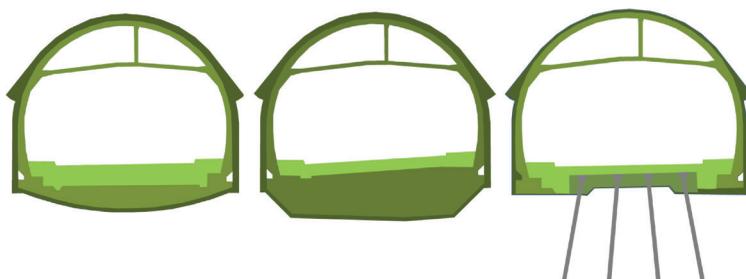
Cross sections in sections with swelling heave: left: Zone DZ I; center: DZ III with invert slab, right: DZ II with tiebacks
